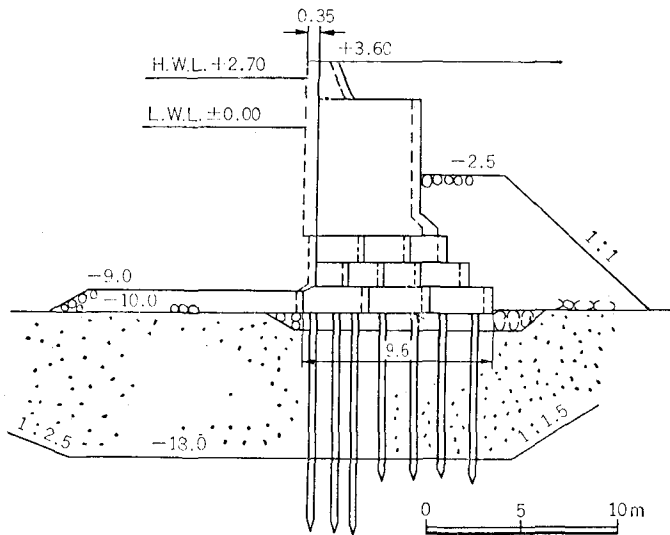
Cross Section of Gravity Type Wall in Uno Port
